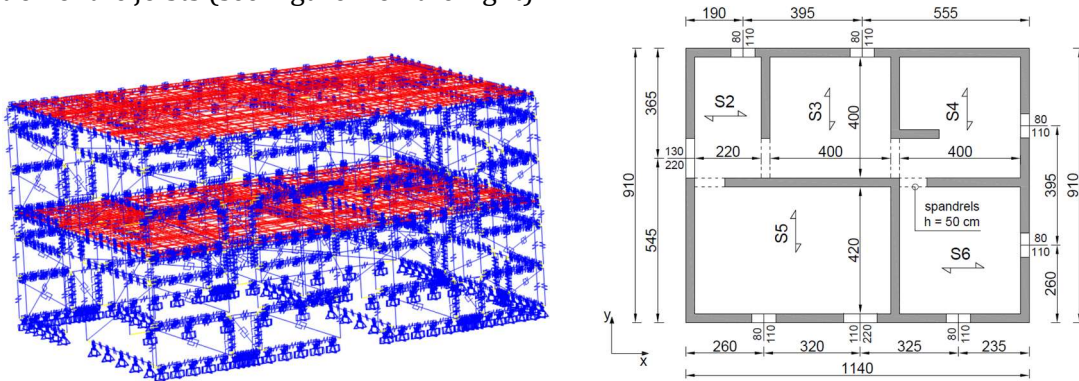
Case-study building A - Finite Element model (left); Building plan geometry (right)
